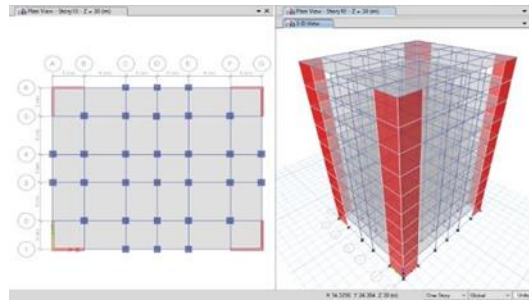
Plan and 3D view of model with corner shear walls without openings.
